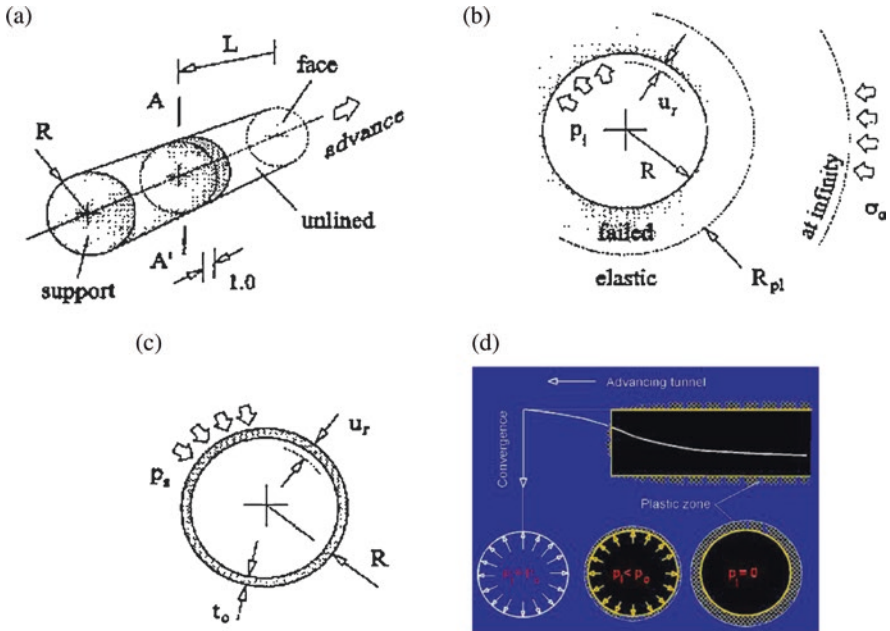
Idealized tunnel excavation; (a) cylindrical tunnel of radius R driven in rock mass, (b) Cross section of the rock mass at section A-A', (c) Cross section of the circular support installed at section A-A', and (d) longitudinal tunnel showing convergence with the loss of confinement during tunnel advance (after Carranza-Torres and Fairhurst 2000)
